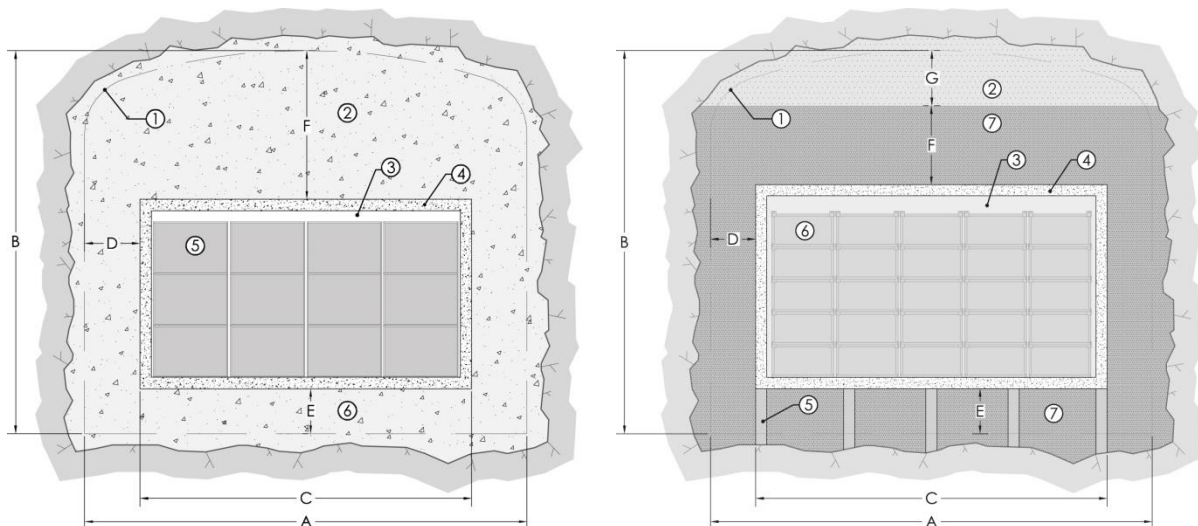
Left image: Schematic illustration of the preliminary cross-sectional layout of the repository section for the metallic waste, Legend: 1) Theoretical tunnel contour. 2) Concrete. 3) Grout. 4) Reinforced concrete (0.5 m). 5) Steel tank. 6) Concrete. Right image: Schematic illustration of the preliminary cross-sectional layout of the repository section for the legacy waste. Legend: 1) Theoretical tunnel contour. 2) Bentonite pellets. 3) Grout. 4) Concrete structure for the operating phase (0.5 m). 5) Granite pillars. 6) Waste container. 7) Bentonite blocks.
